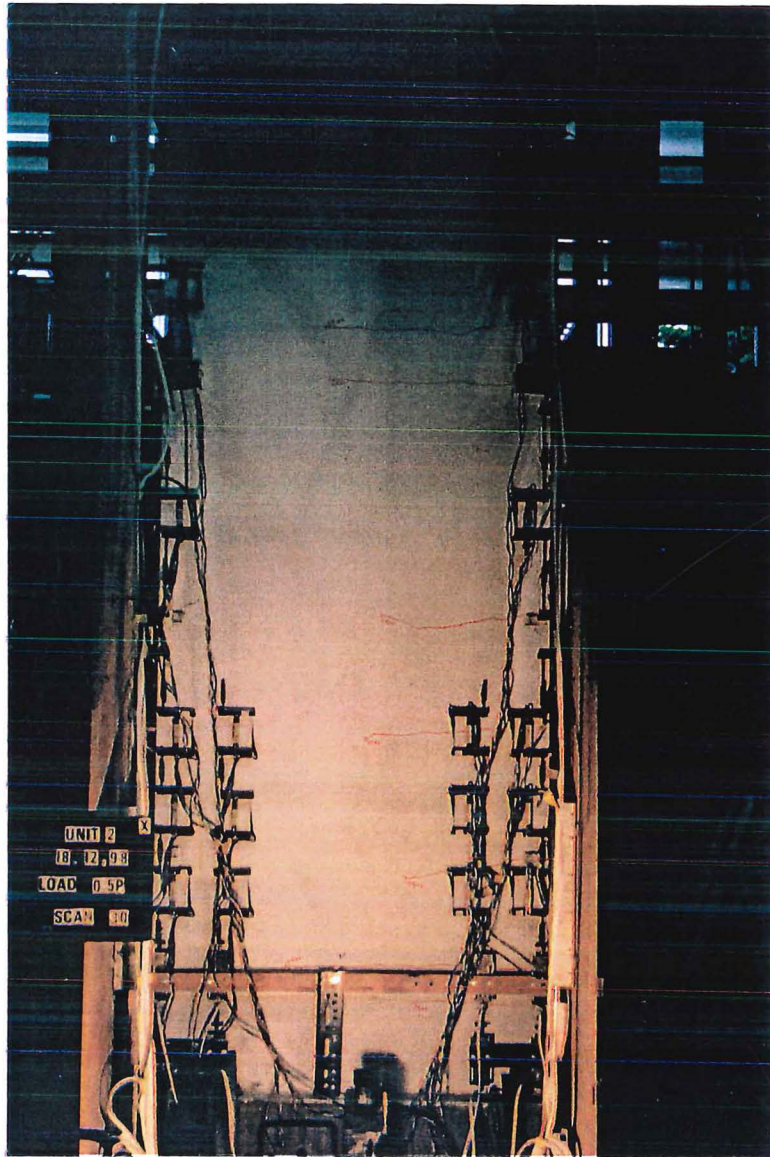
View of Unit 2 at cracking strength (South/Concave)
